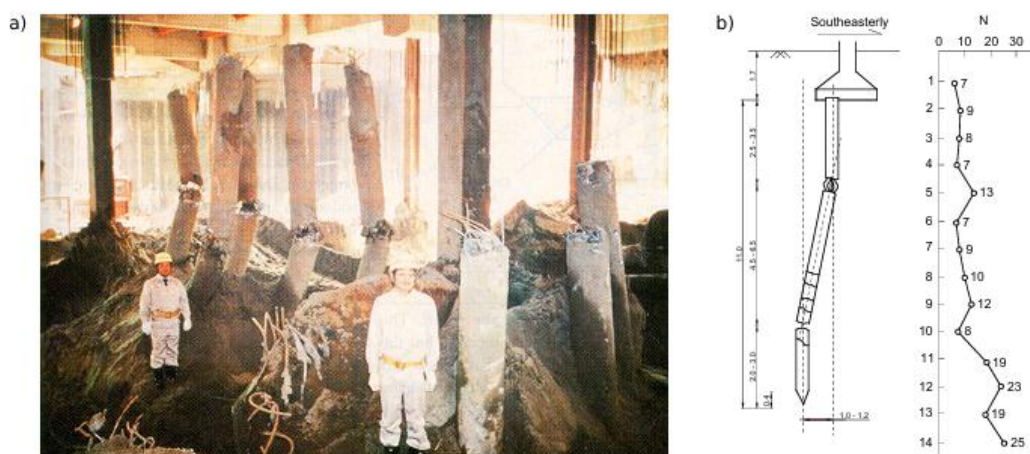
NHK building after 1964 Niigata earthquake: a) piles damaged by lateral spreading of the foundation soil and b) correction of pile damage and site conditions (M. Hamada, 1991)
